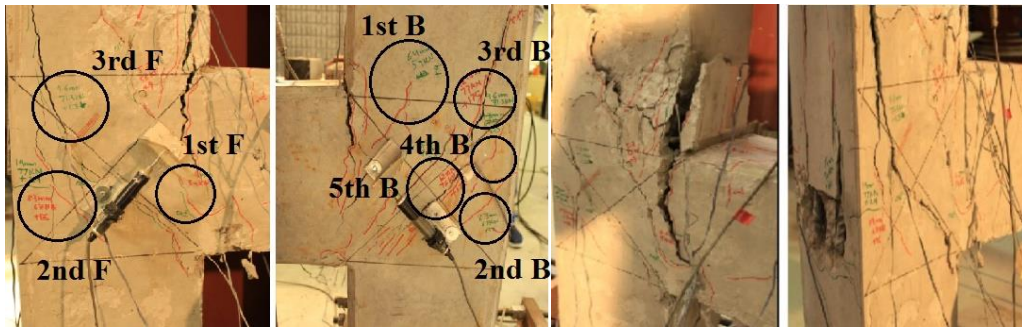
Shear cracks at the front and back face of joint and failure of the specimen
